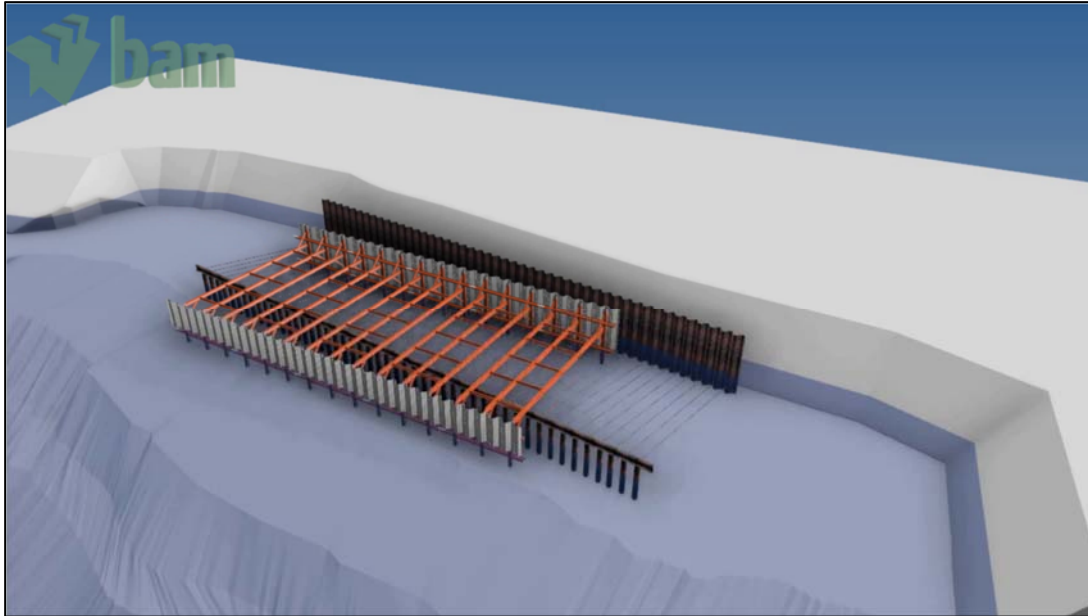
Illustration of five steel frames between the rear to mid wall
